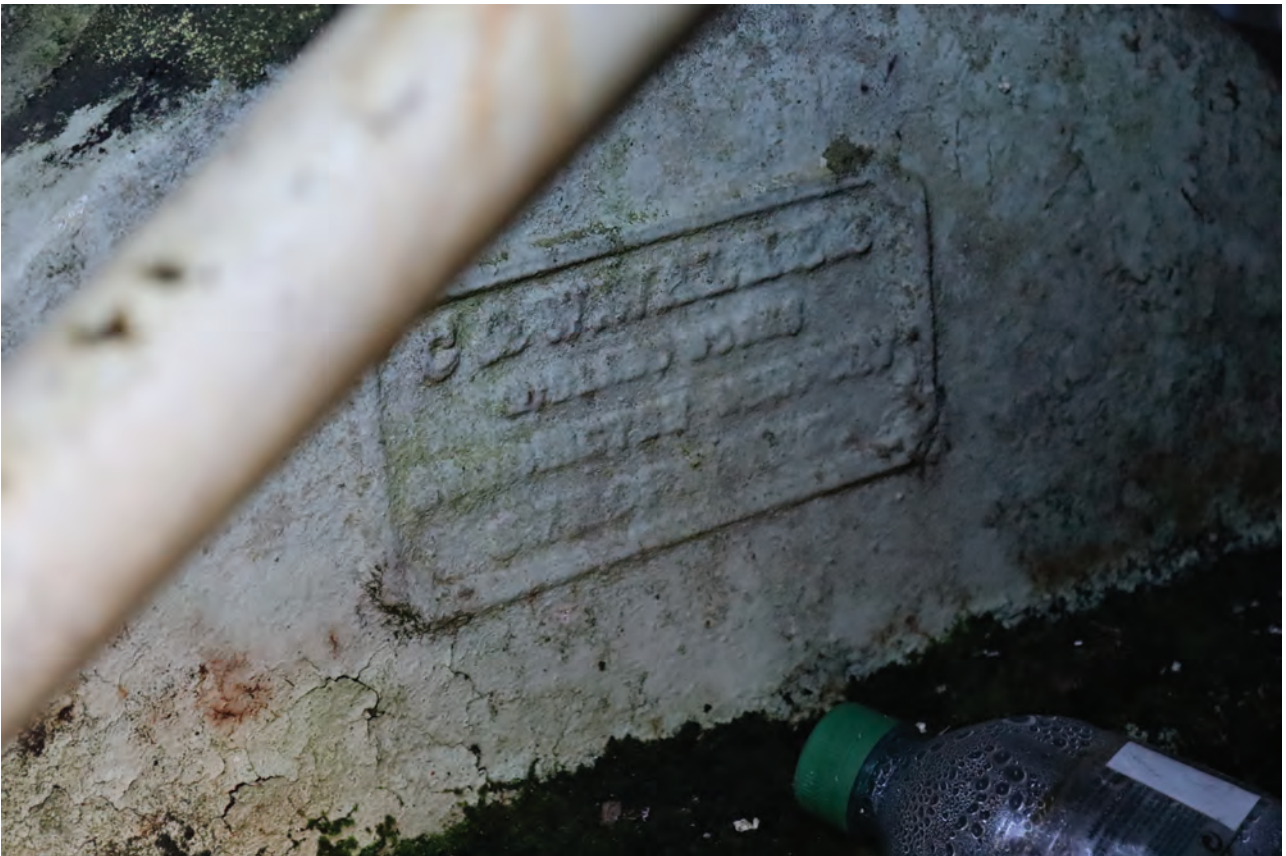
Gasholder No 1, detail view of C & W maker's mark within the inlet/outlet building, from the west
